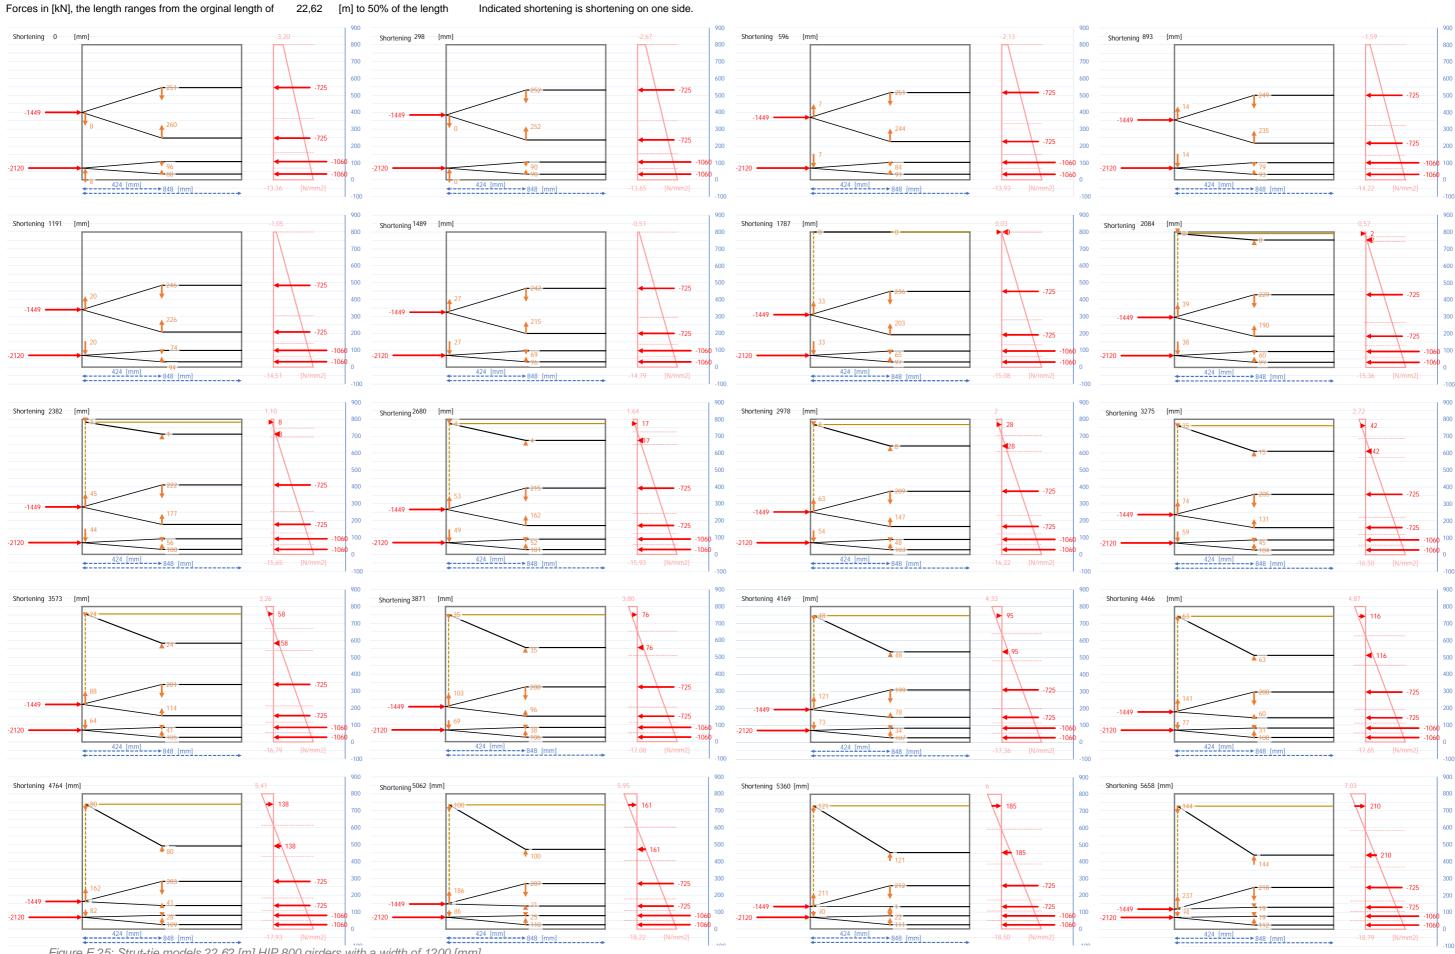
Strut-tie models 22,62 [m] HIP 800 girders with a width of 1200 [mm].
